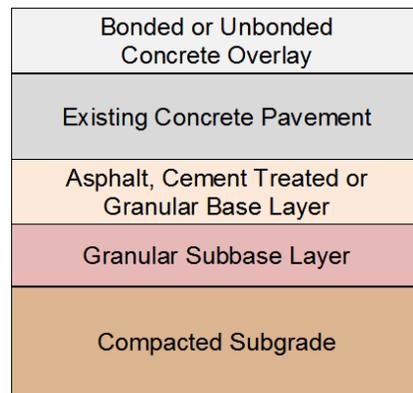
Cross section of concrete pavement structures rehabilitated with overlays (not to scale).
